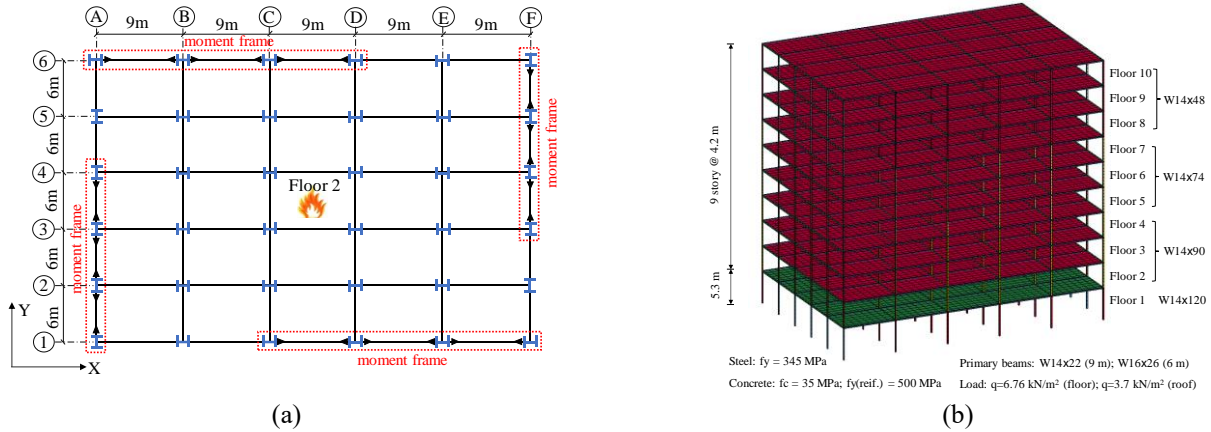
Modeling of a 3D 10-storey prototype building: (a) plan view and (b) finite element model
